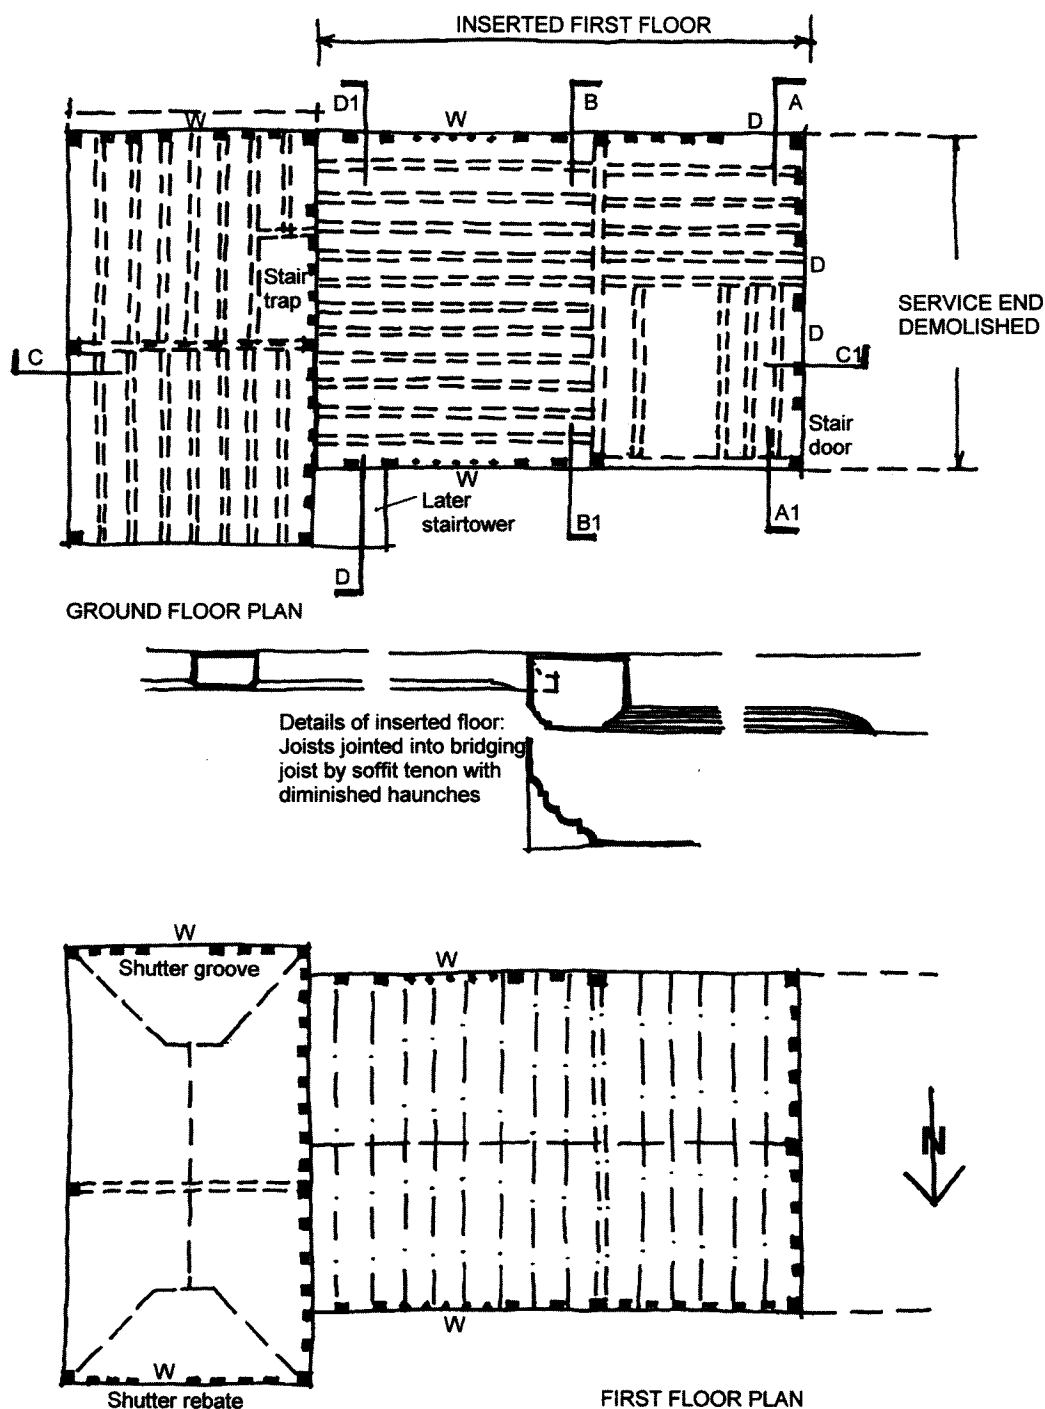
Brocks Farmhouse, ground and first-floor plans.
